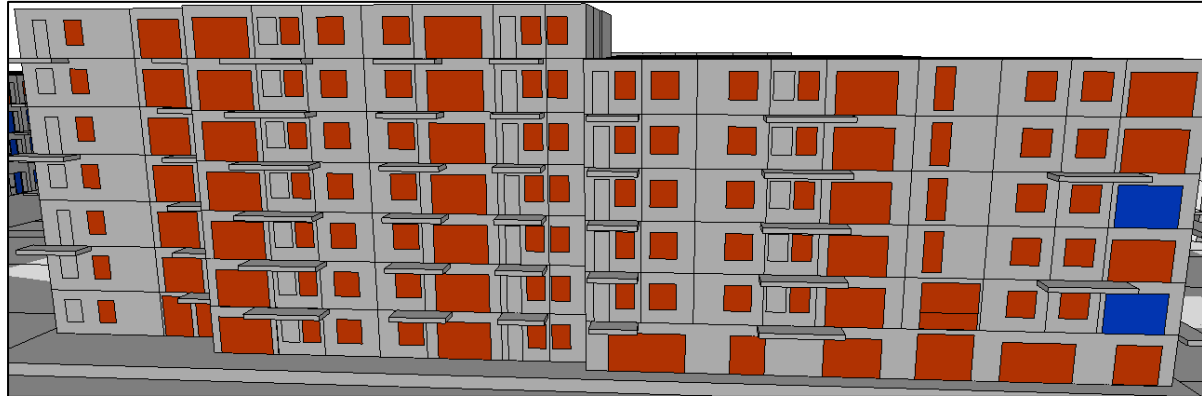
Windows achieving 1.5 hours of sunlight - Northeast elevation of Building 07 (modelling software)
